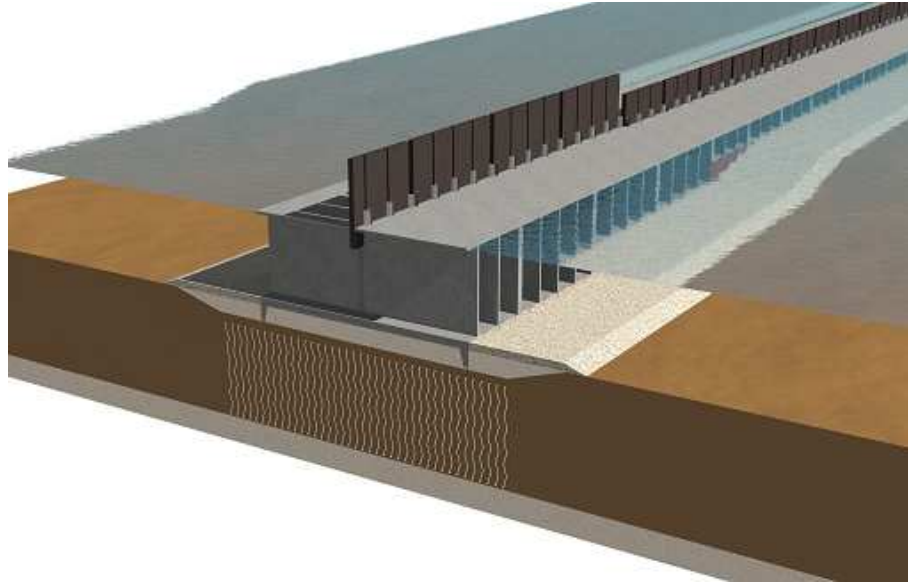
Birds eye sectional view of caisson barrier with vertical drain soil improvement (de Vries, 2014).
